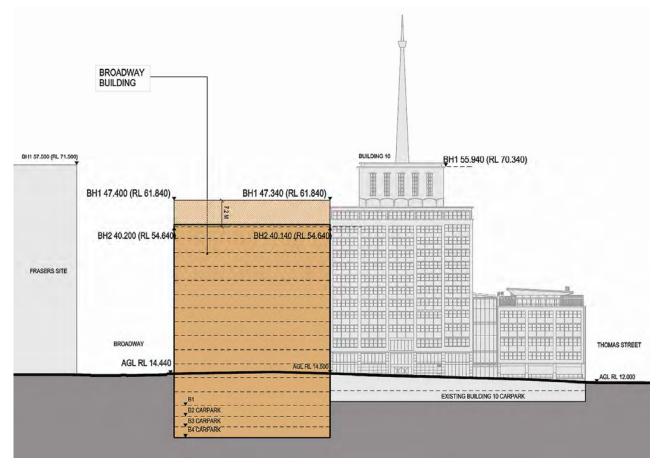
East elevation - Jones Street (Source: BVN and DCM)
